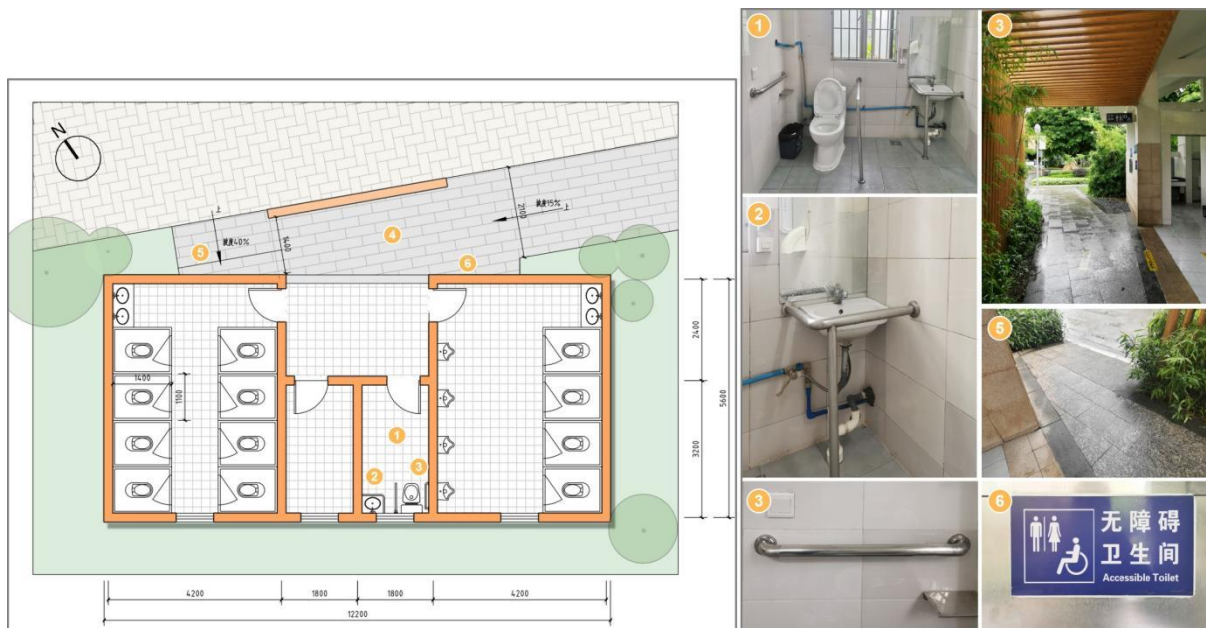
Plan and Dimensions of Public toilet (Source: Completed by author)
